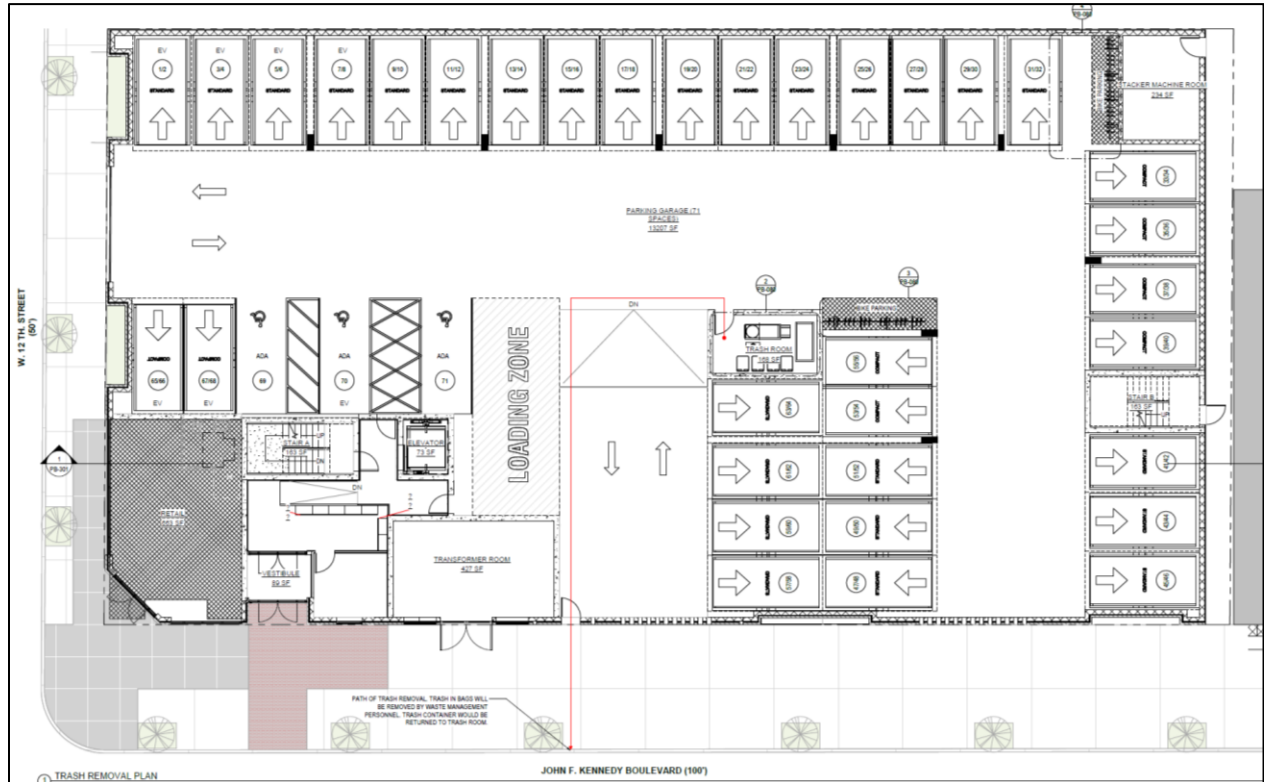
Proposed Ground Floor Plan – Parking Level (from plans by GRO Architects 6/17/26)
